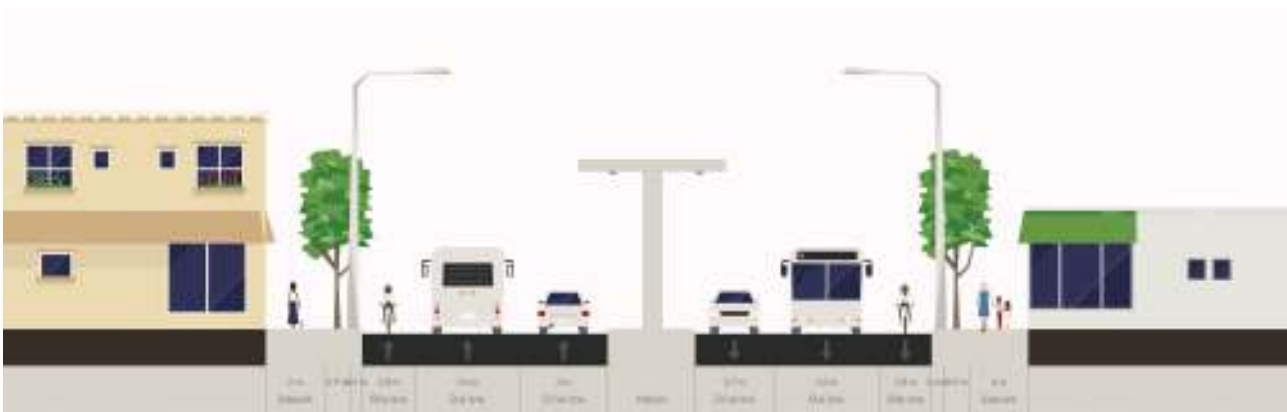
P2- Cross Section of the Bandaranayaka Road
